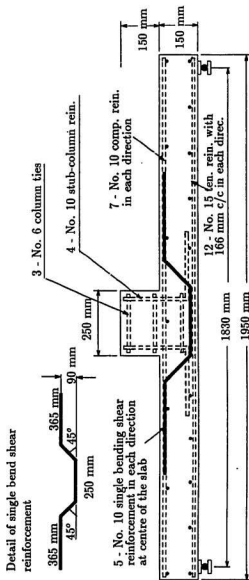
Dimension and reinforcement details of the slab with single bend shear reinforcement (HS18)
